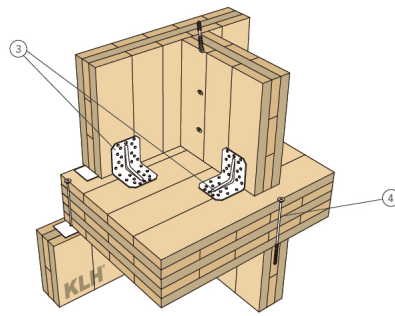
Example sketch of Cross Laminated Timber elements by KLH [9]. Labels 3 and 4 refer to the metal connectors and bolts of the assembled structure.
